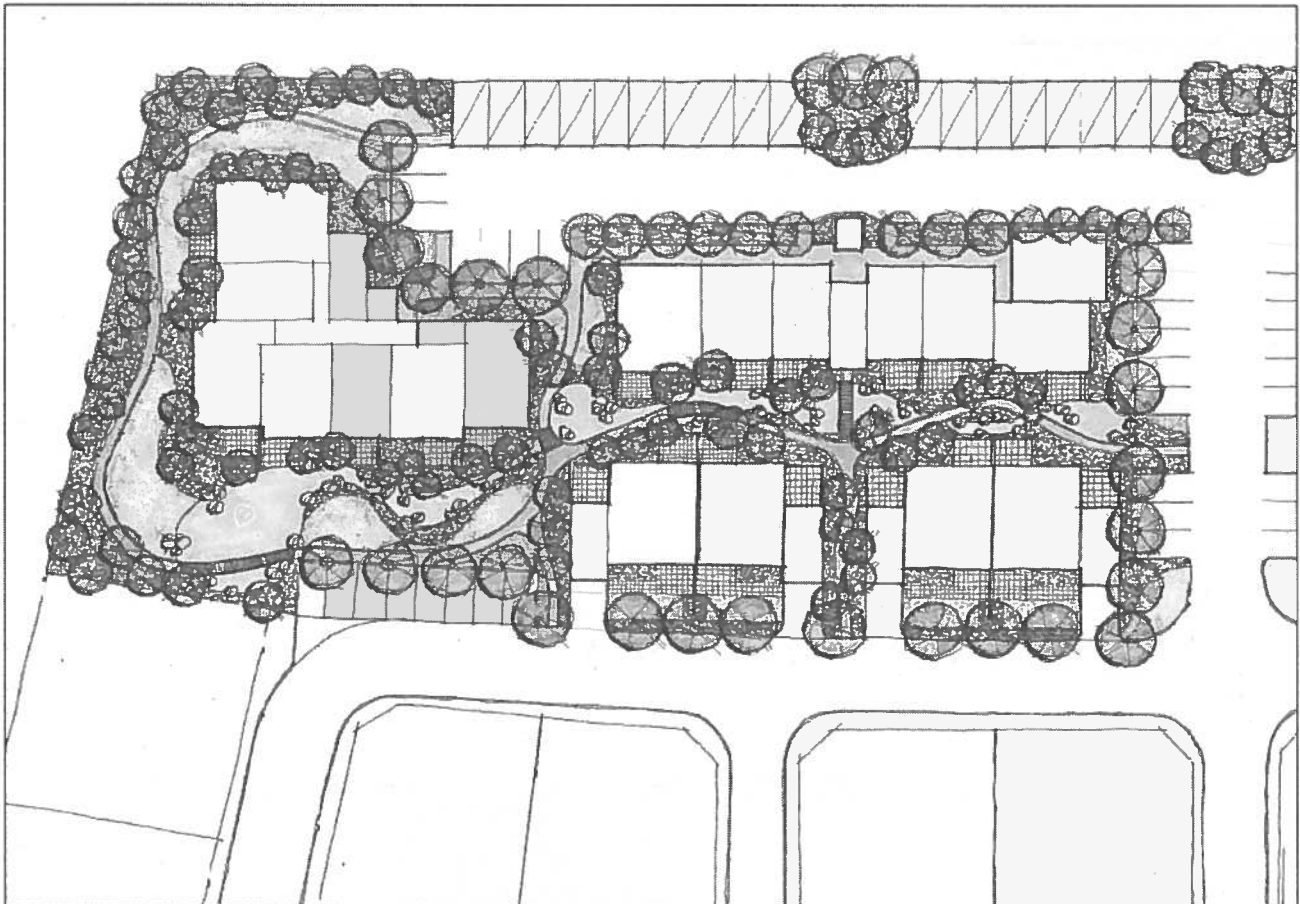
Landscape Plan (Johan de Villiers Landscape Architects)
